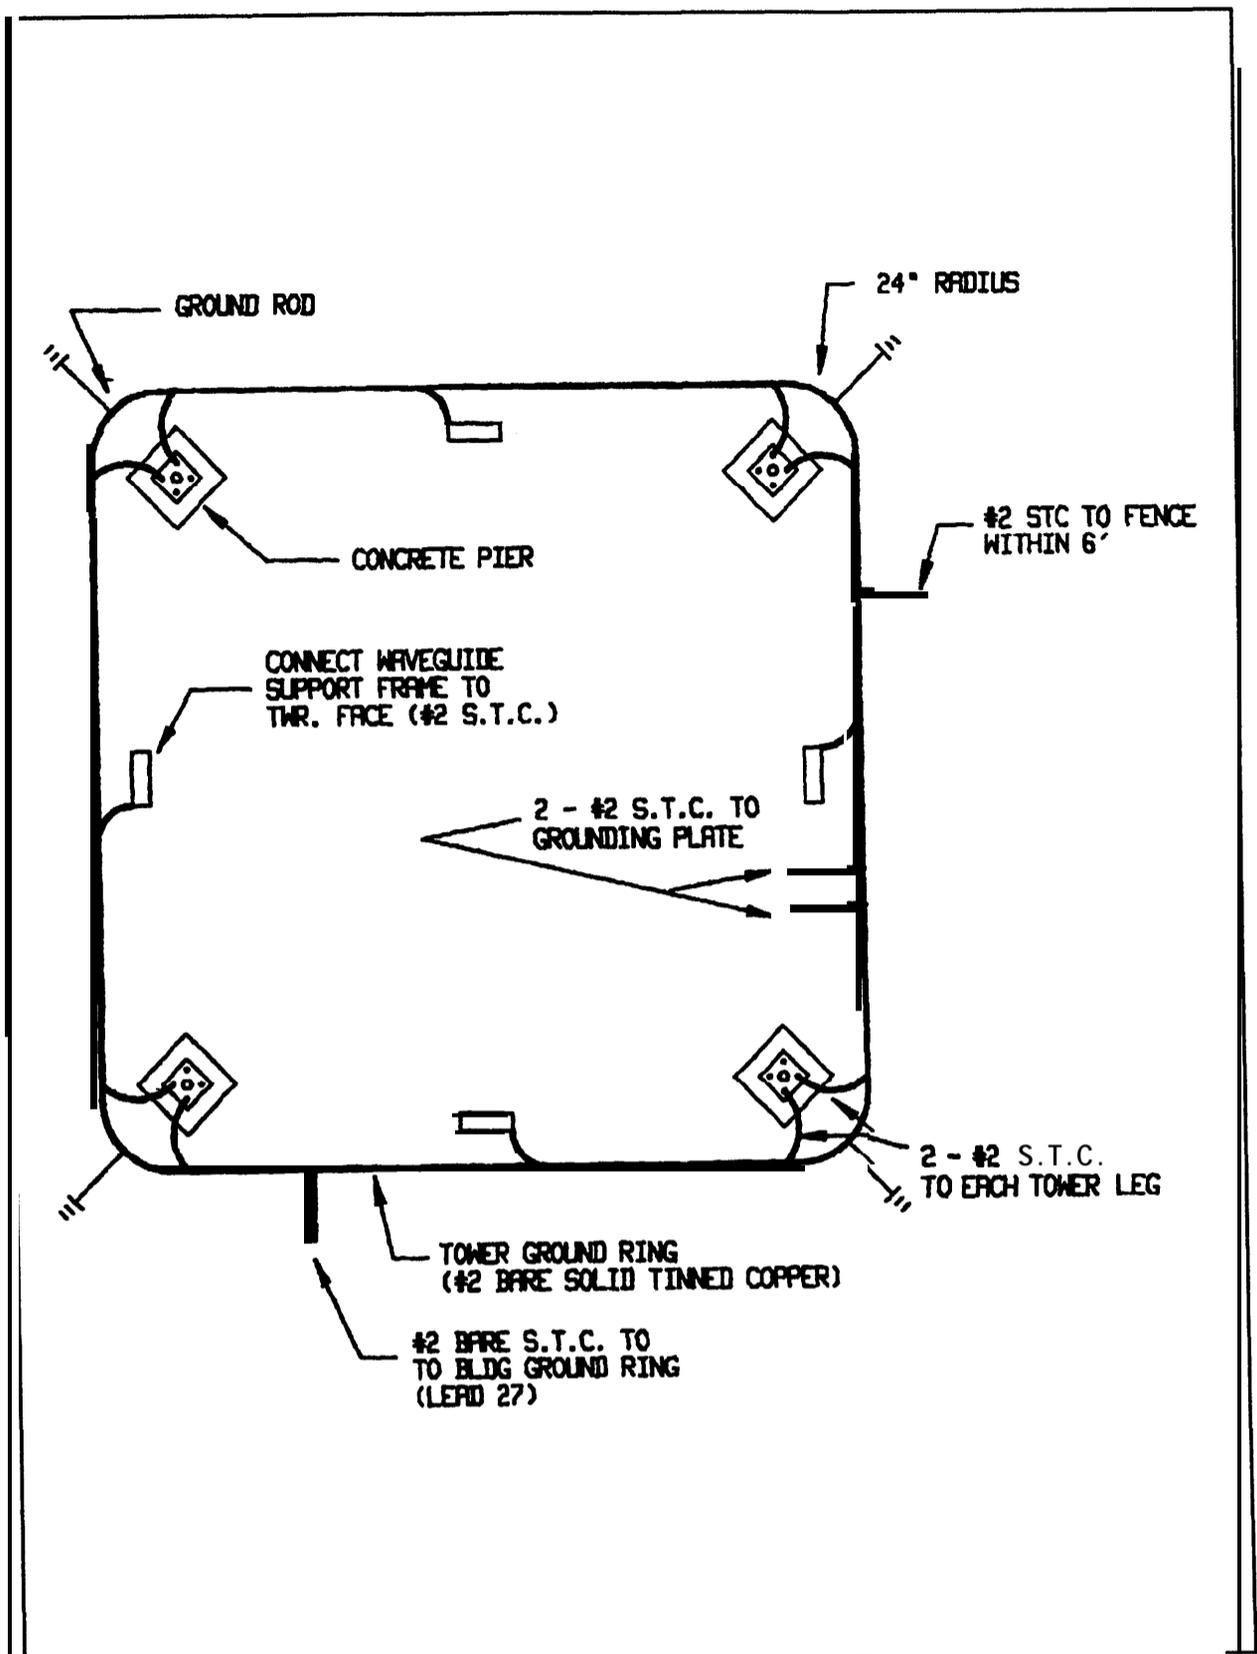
Radio Station Grounding Self-Supporting Tower Plan
